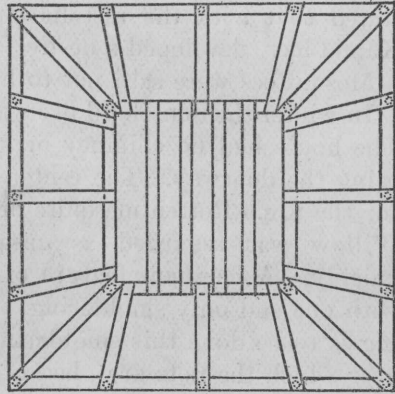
Schematic drawing showing arrangement of posts and roof timbers in a large house, about 40 feet square
